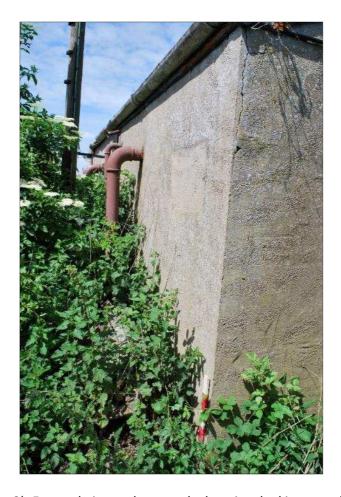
(Shot 3): External pipework on south elevation, looking west (0.5m scale)
